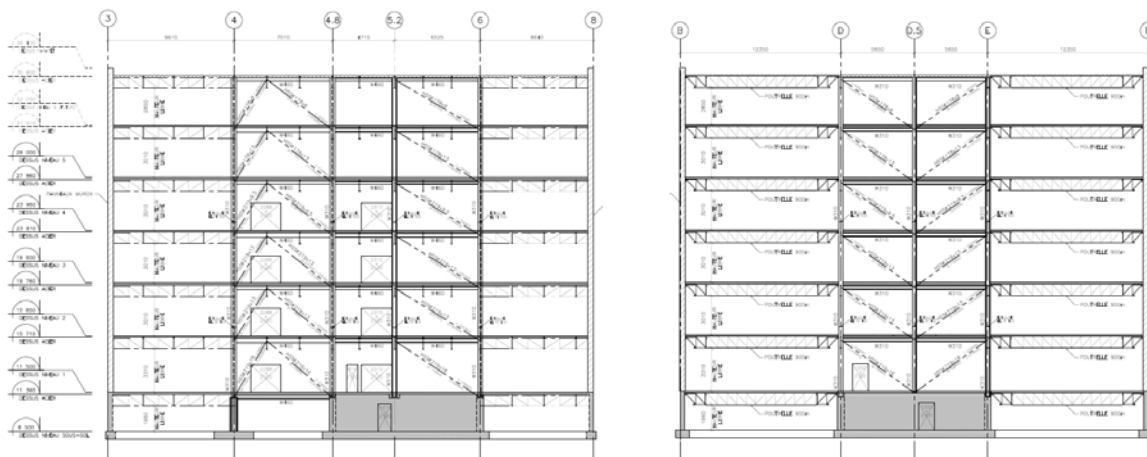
Braced frame elevations for the Sandoz Canada Administration Building (courtesy of Canam Group Inc.)
